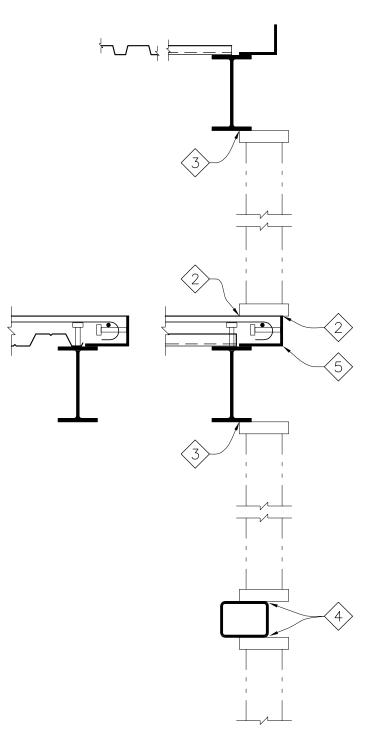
CURTAIN WALL CONSTRUCTION ISSUES
